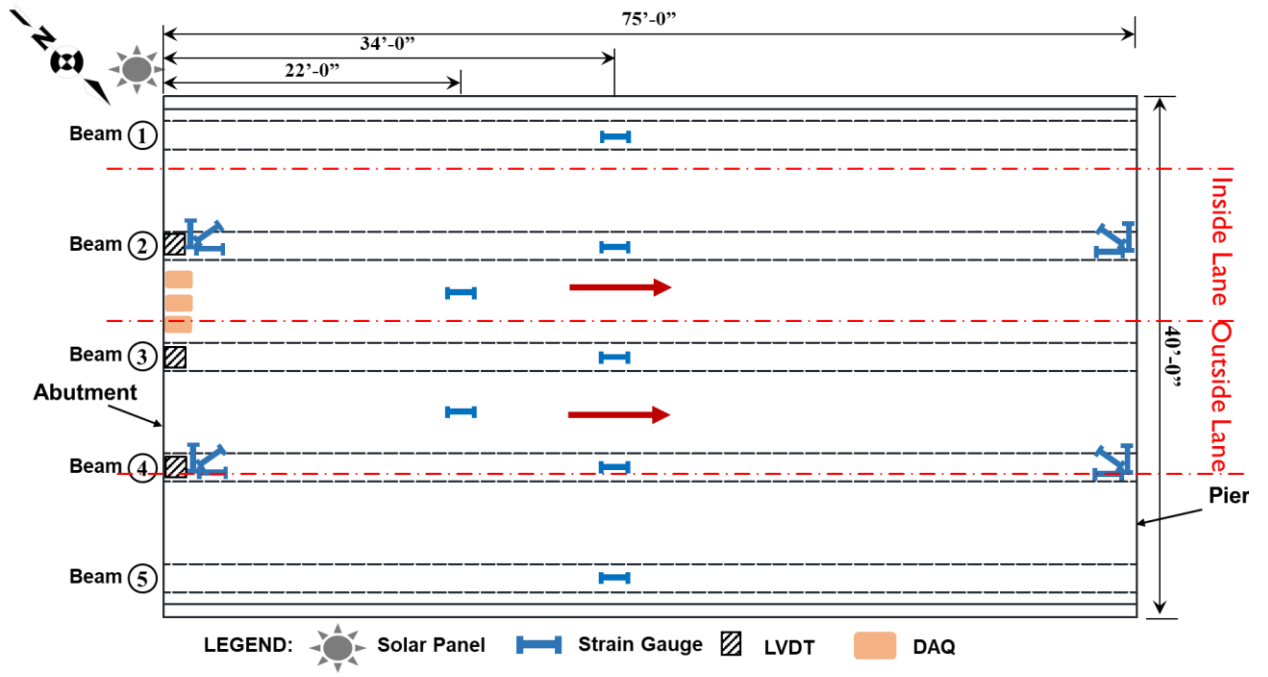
Modified Bridge #2 Instrumentation Plan.
